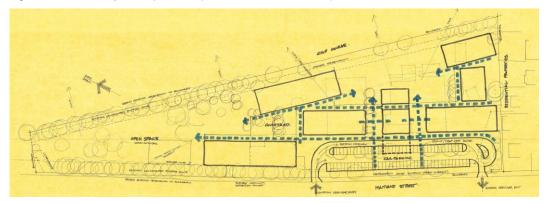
Preliminary Concept Plan B (Source: NBRS Architecture)
